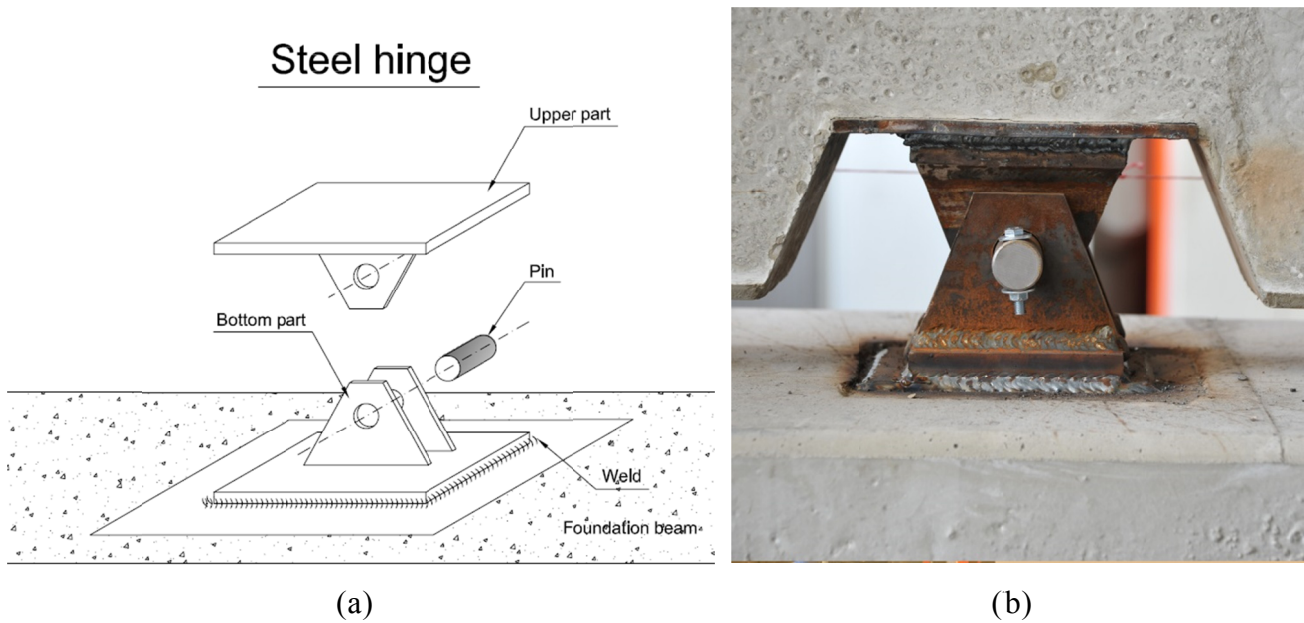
Base hinge: (a) drawing and (b) picture
